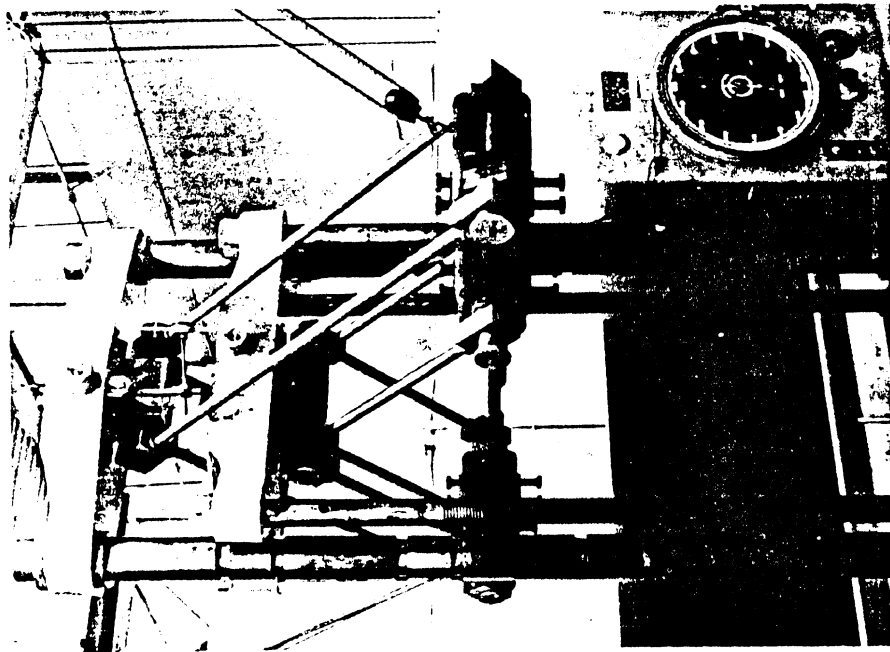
Four point bending fixture with small channel specimen installed, prior to test.
